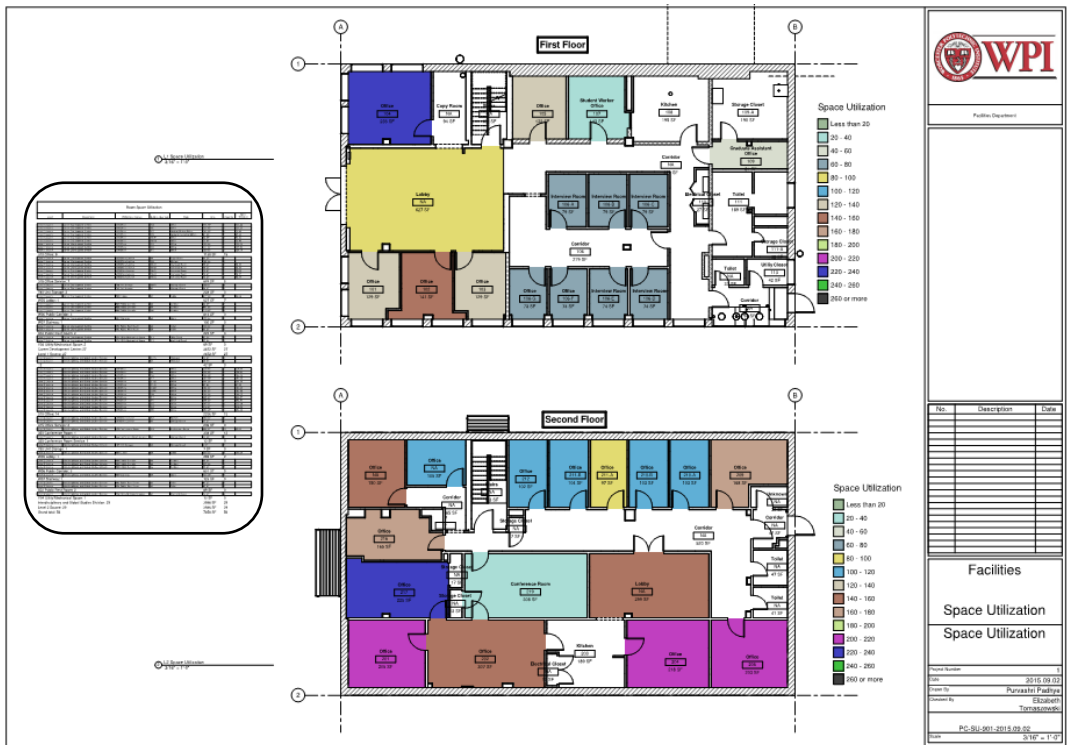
Drawing sheet indicating Space Utilization and room capacities.
